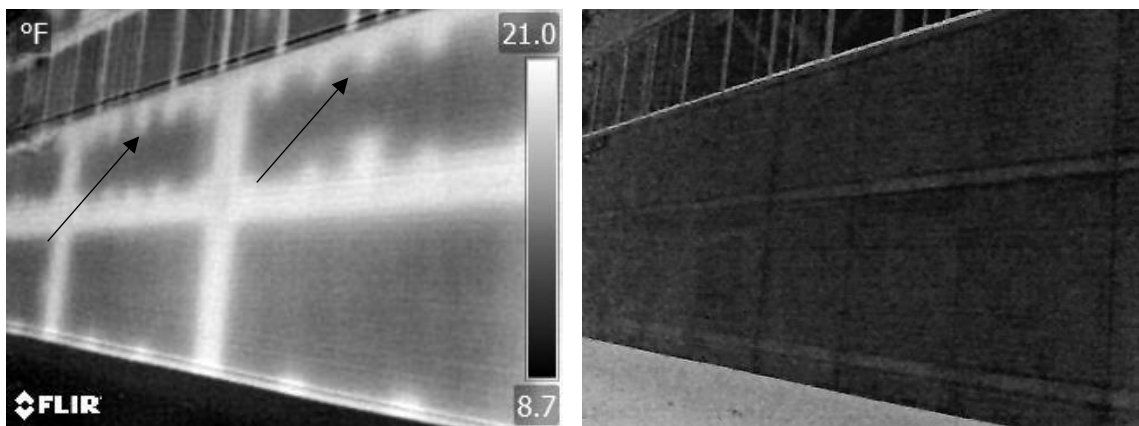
SWP structure with heavy thermal bridging where 2nd floor terminates (note arrows): thermal image (left) and visual image (right)
